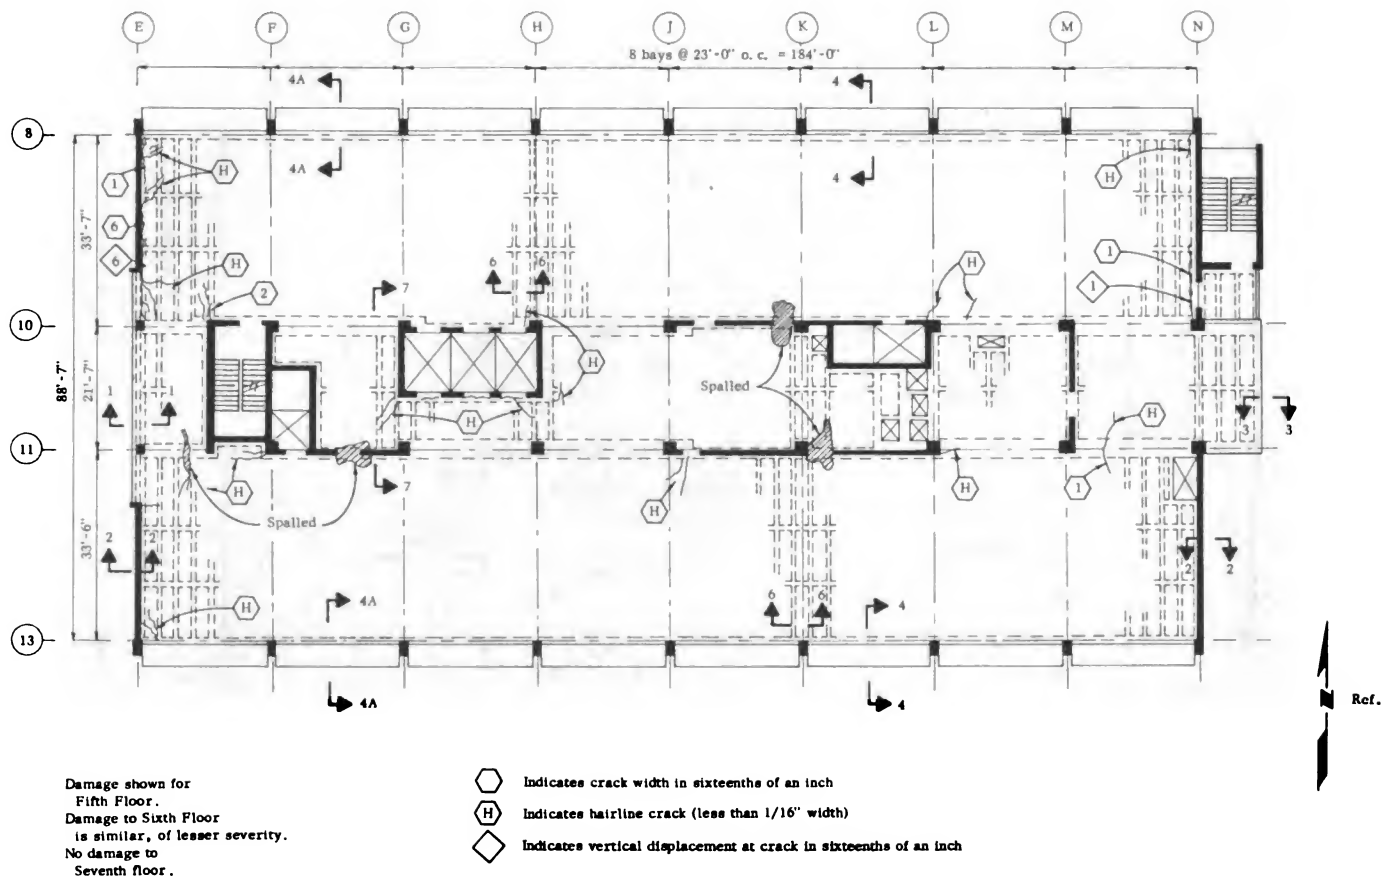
Holy Cross Hospital. Fifth-floor framing plan (7-story tower). Sixth and seventh floors are similar.
